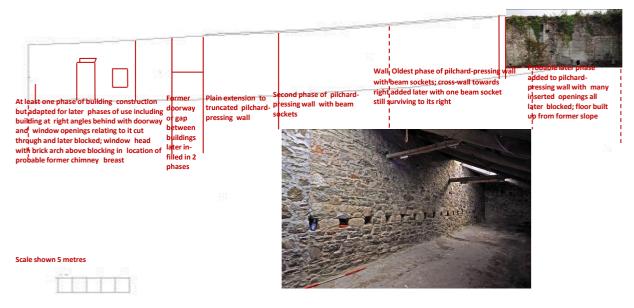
Annotated elevation of spine wall from NW to show phases, the background shape copied from survey drawings provided by the architect (see also photographs, Figs 50-64
